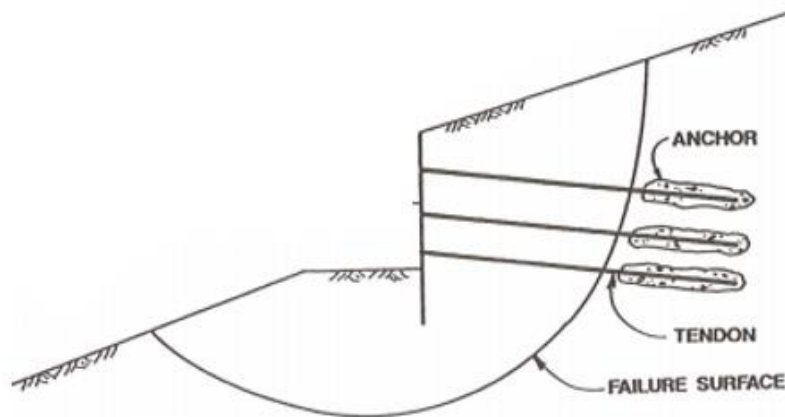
Structural reinforcement features extend past the failure surface to provide stability (from Abramson et al., 2002)
